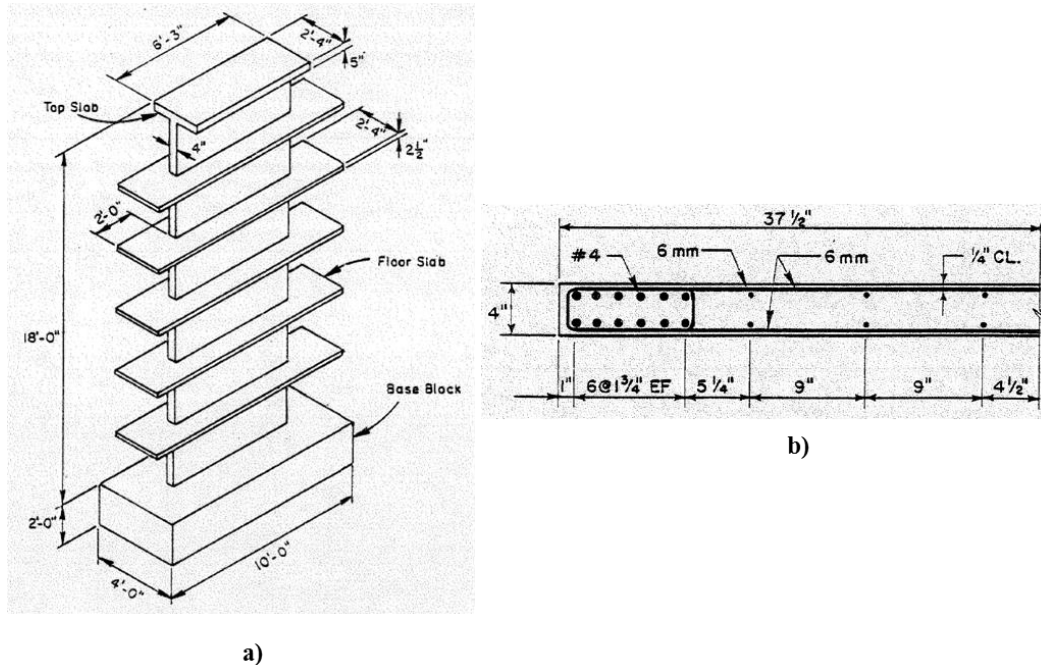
Shiu et al. (1981) specimen CI-1 – a) Overall geometry, and b) Cross-section
